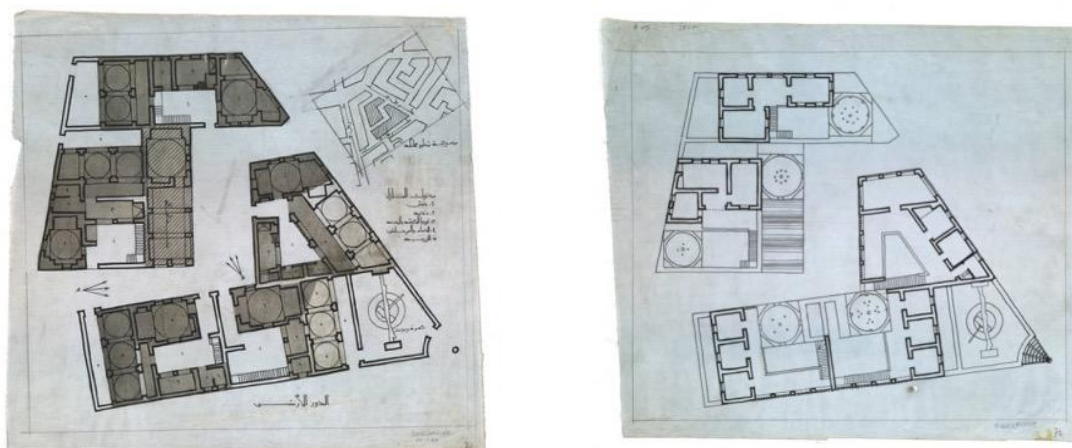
New Gourna housing ground floor units. Left: Ground floor / Right: First floor
